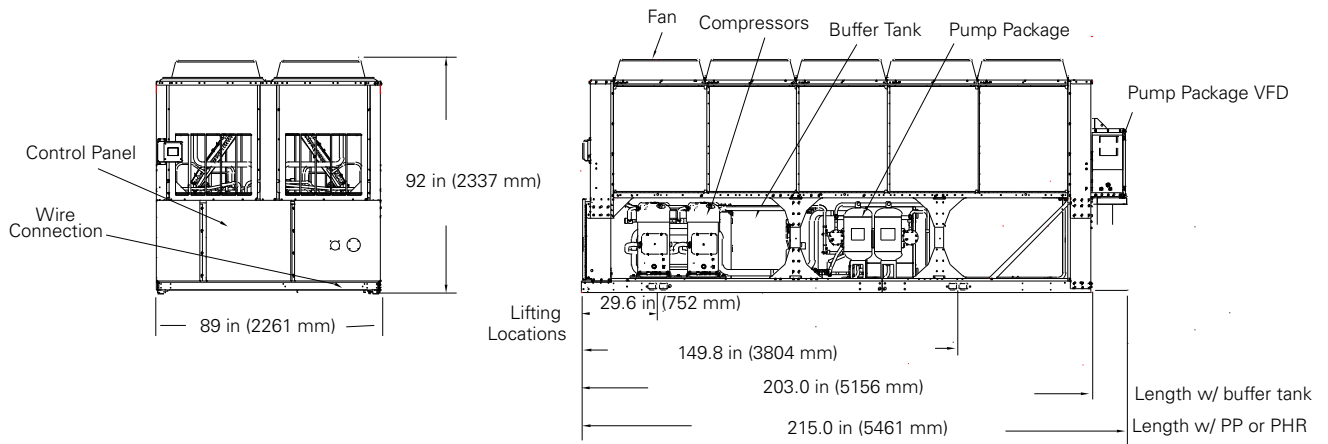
Sizes 80 and 90 ton — pump package, buffer tank, partial heat recovery
